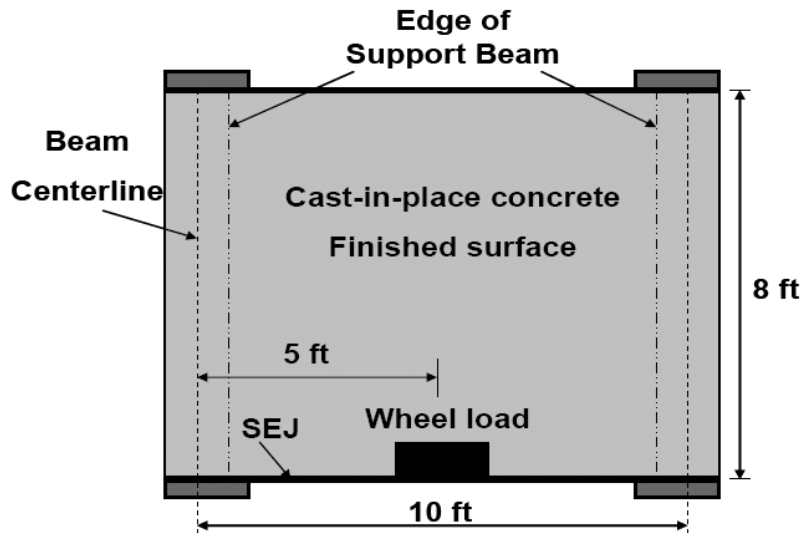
Plan View of Positive Moment Specimen Subject to Fatigue Loading (Agnew 2007)
